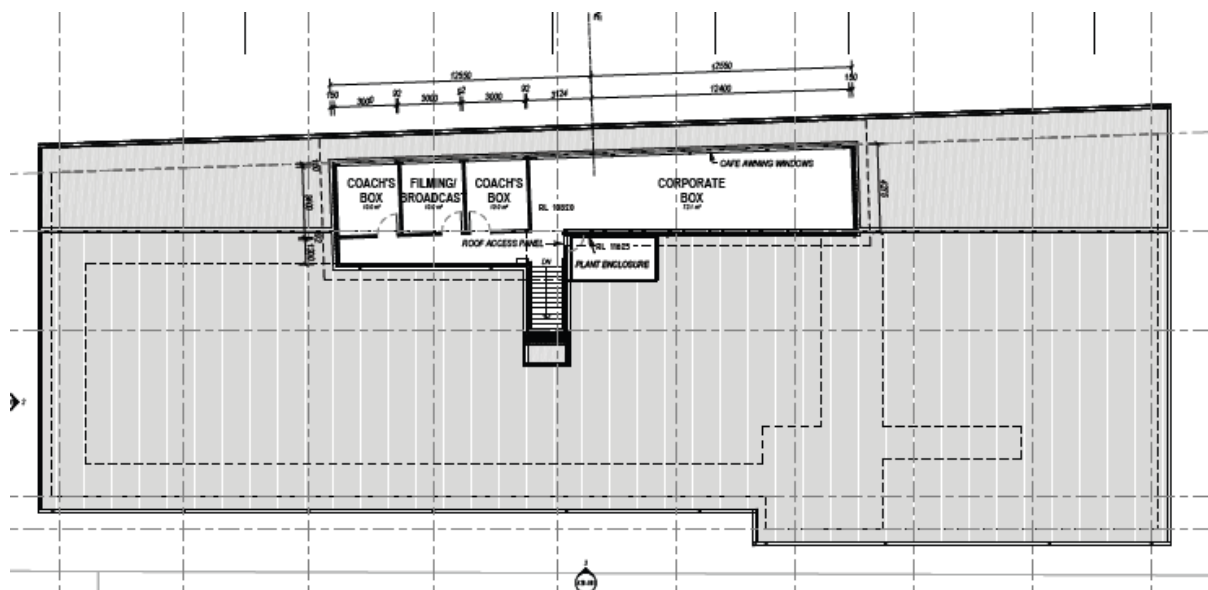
Proposed Second Floor Plan (Source: Rohrig Constructions 2026)
